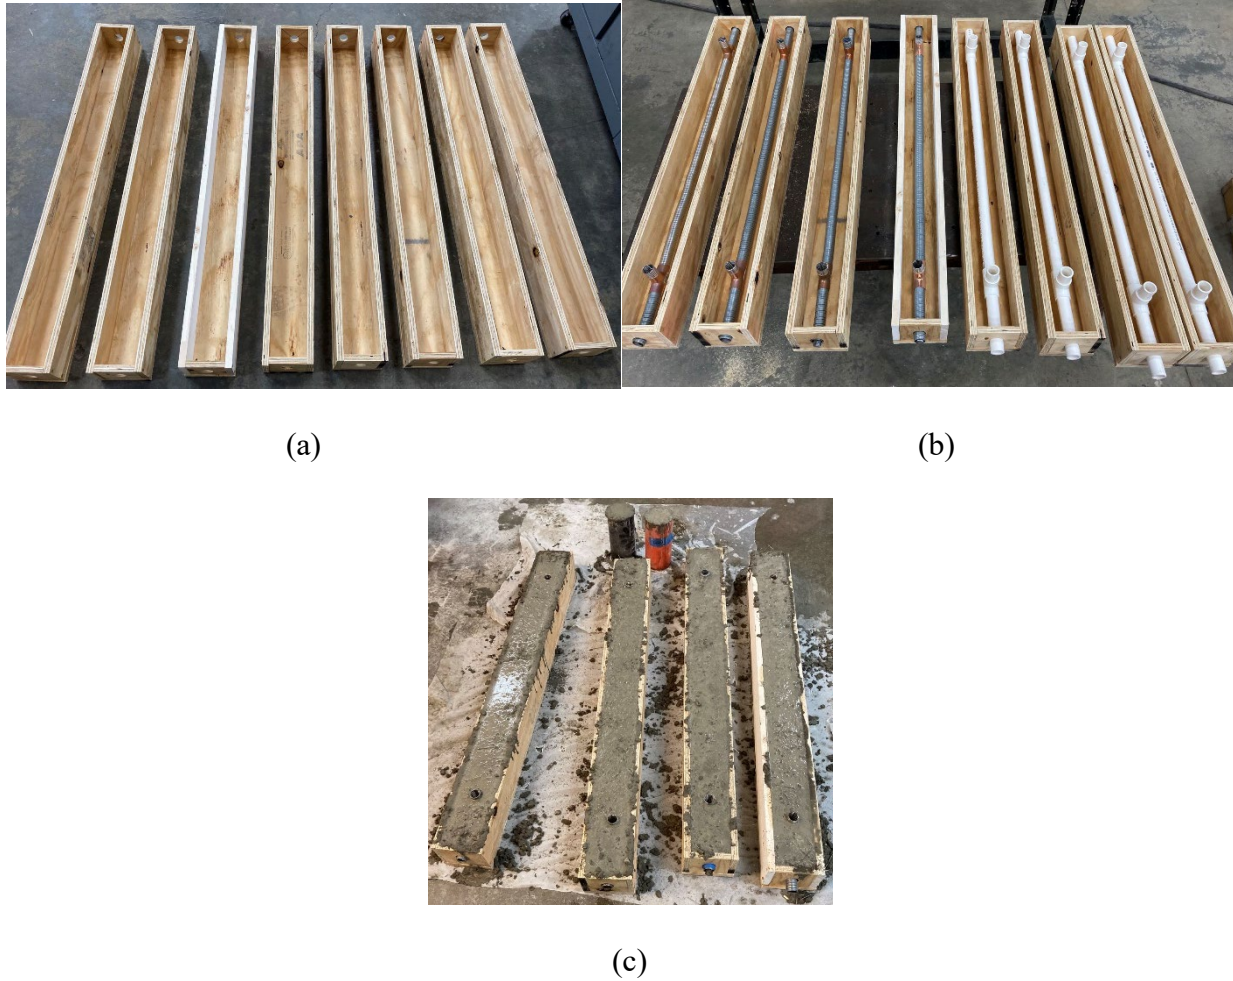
Specimen fabrication: (a) mold assembly; (b) plastic pipe and corrugated steel duct for post-tensioning strand and grouting; (c) casting specimens.
